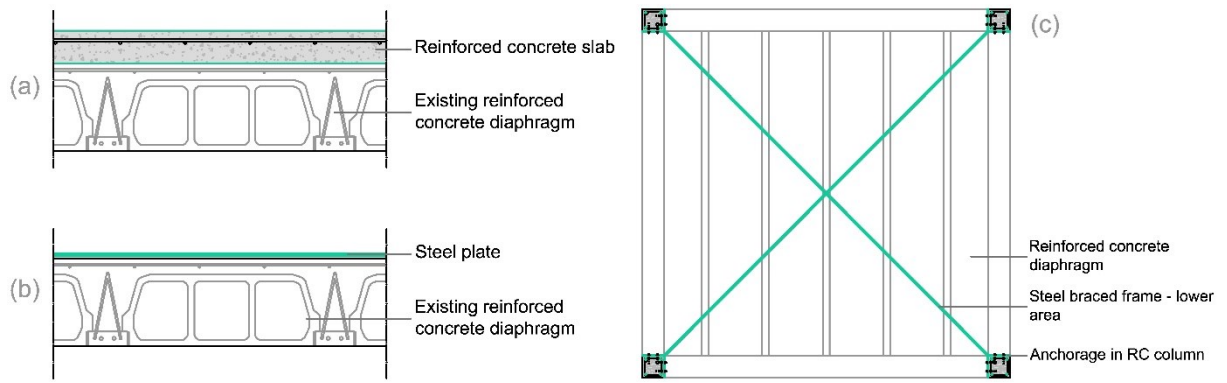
Different configurations for the stiffening of RC slabs: (a) RC slab on existing RC slab; (b) Steel plate on existing RC slab; (c) Steel braces under existing RC slab.
